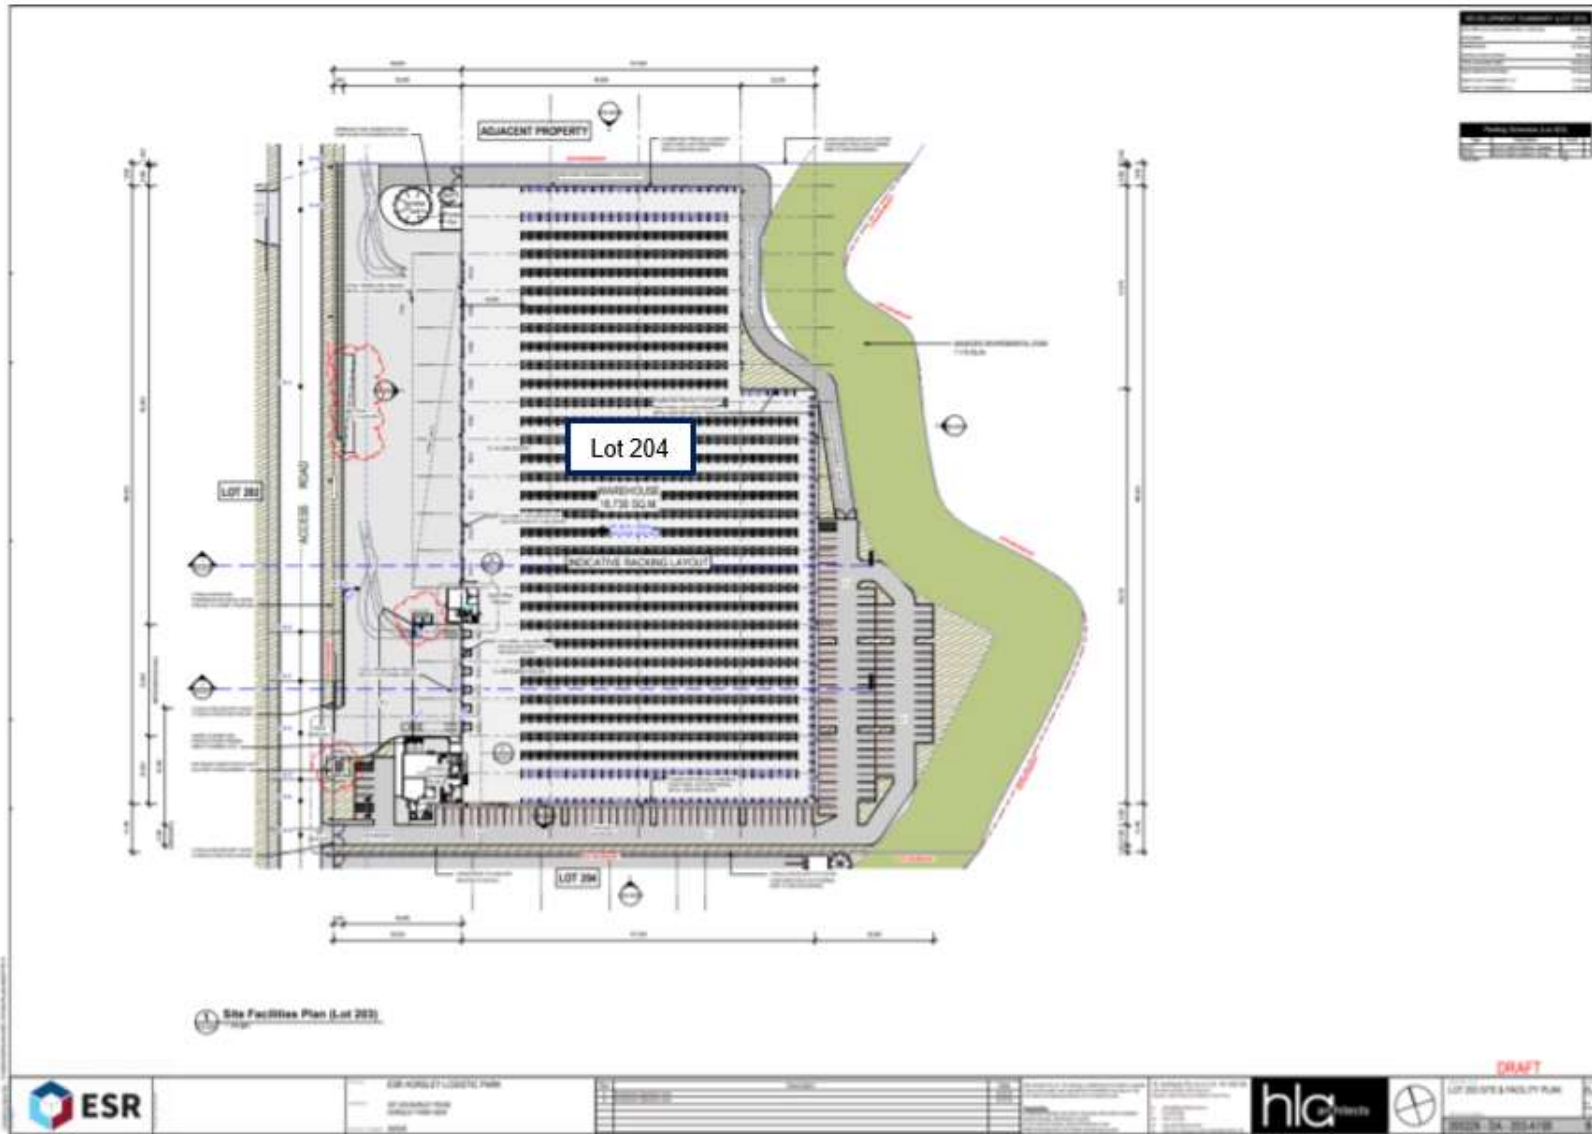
| Approved Lot 204 Site Plan (previously Lot 203)
